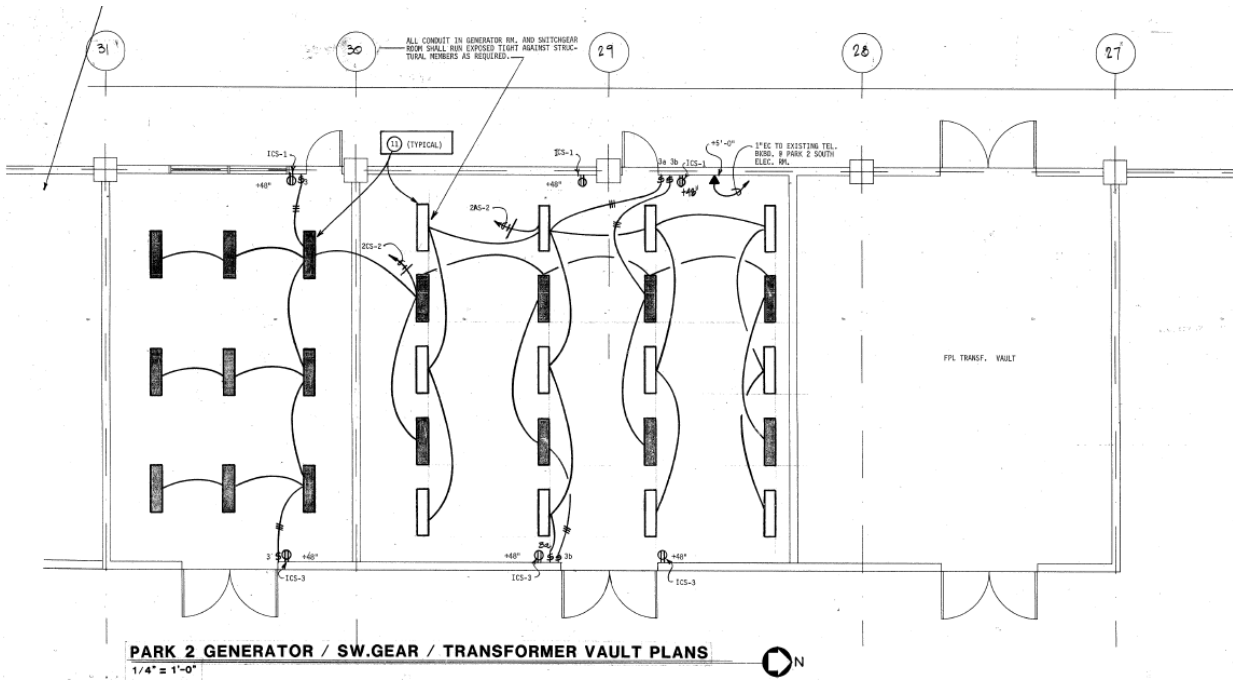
Lighting diagram and layout of switchgear room, generator room, FPL vault.
